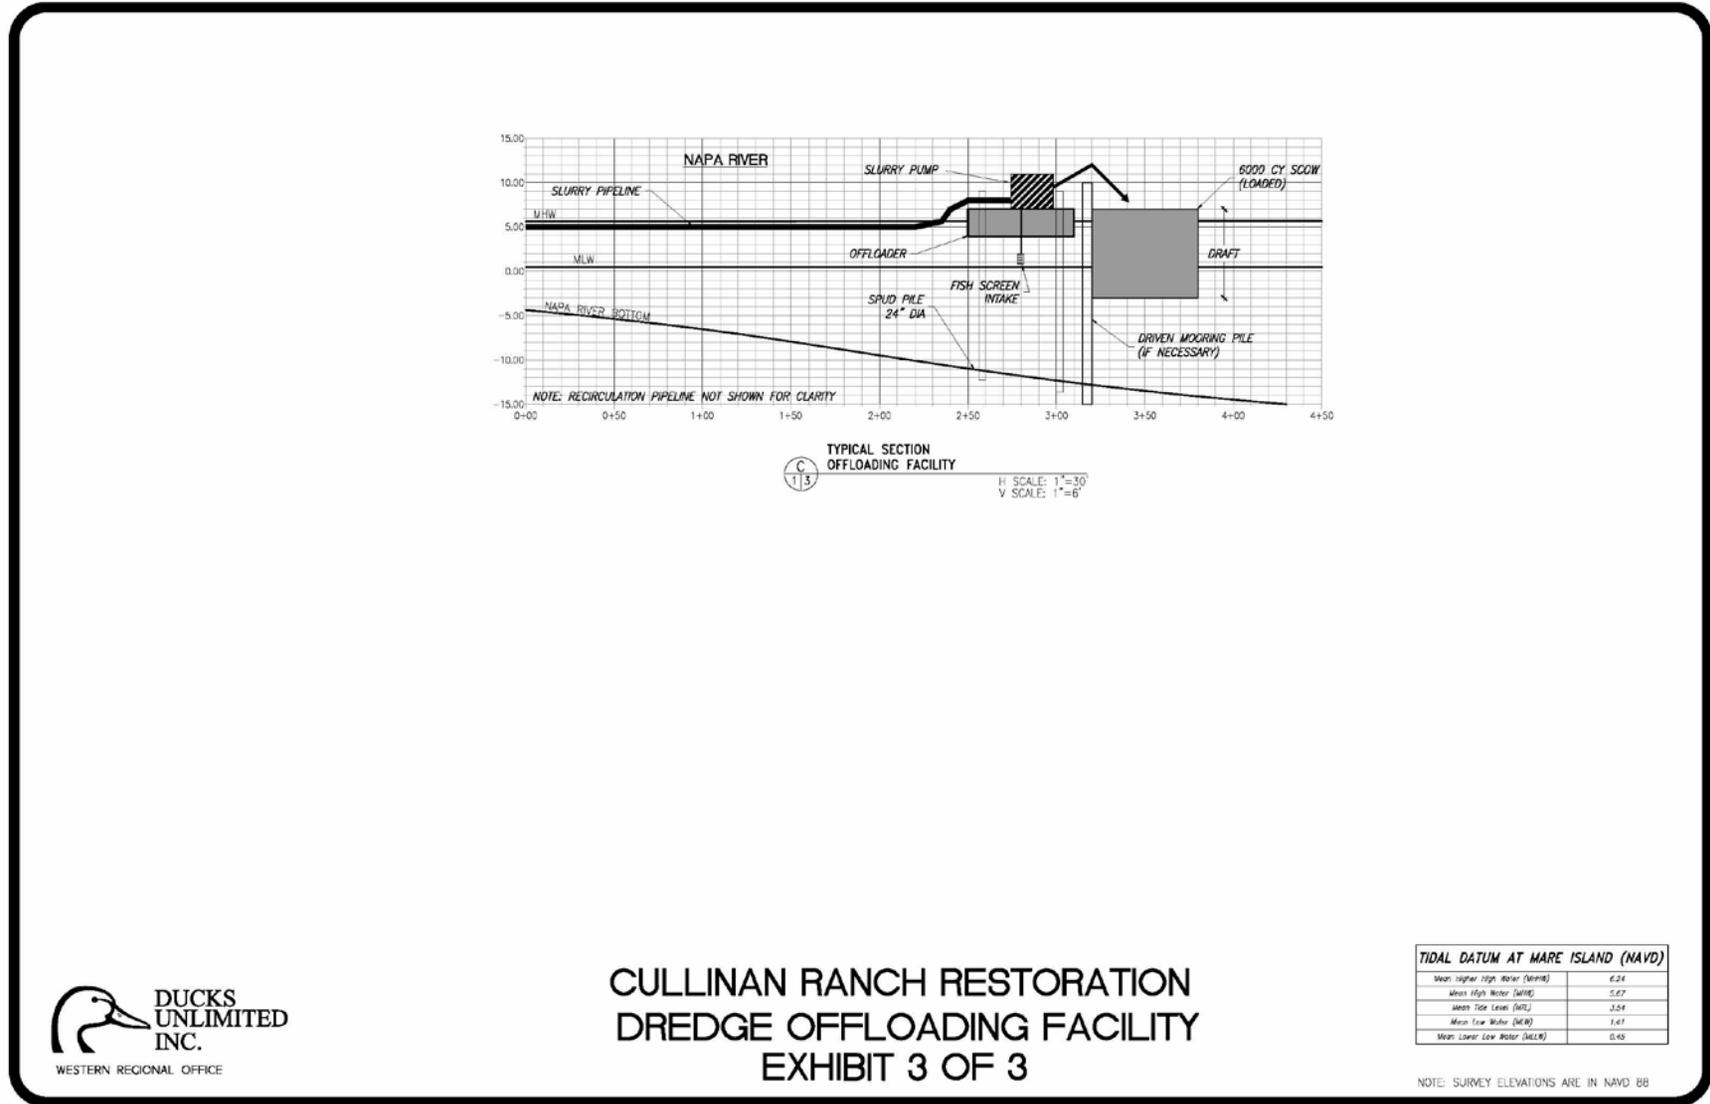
OLF Platform, Pump and Pilings, Typical Section
